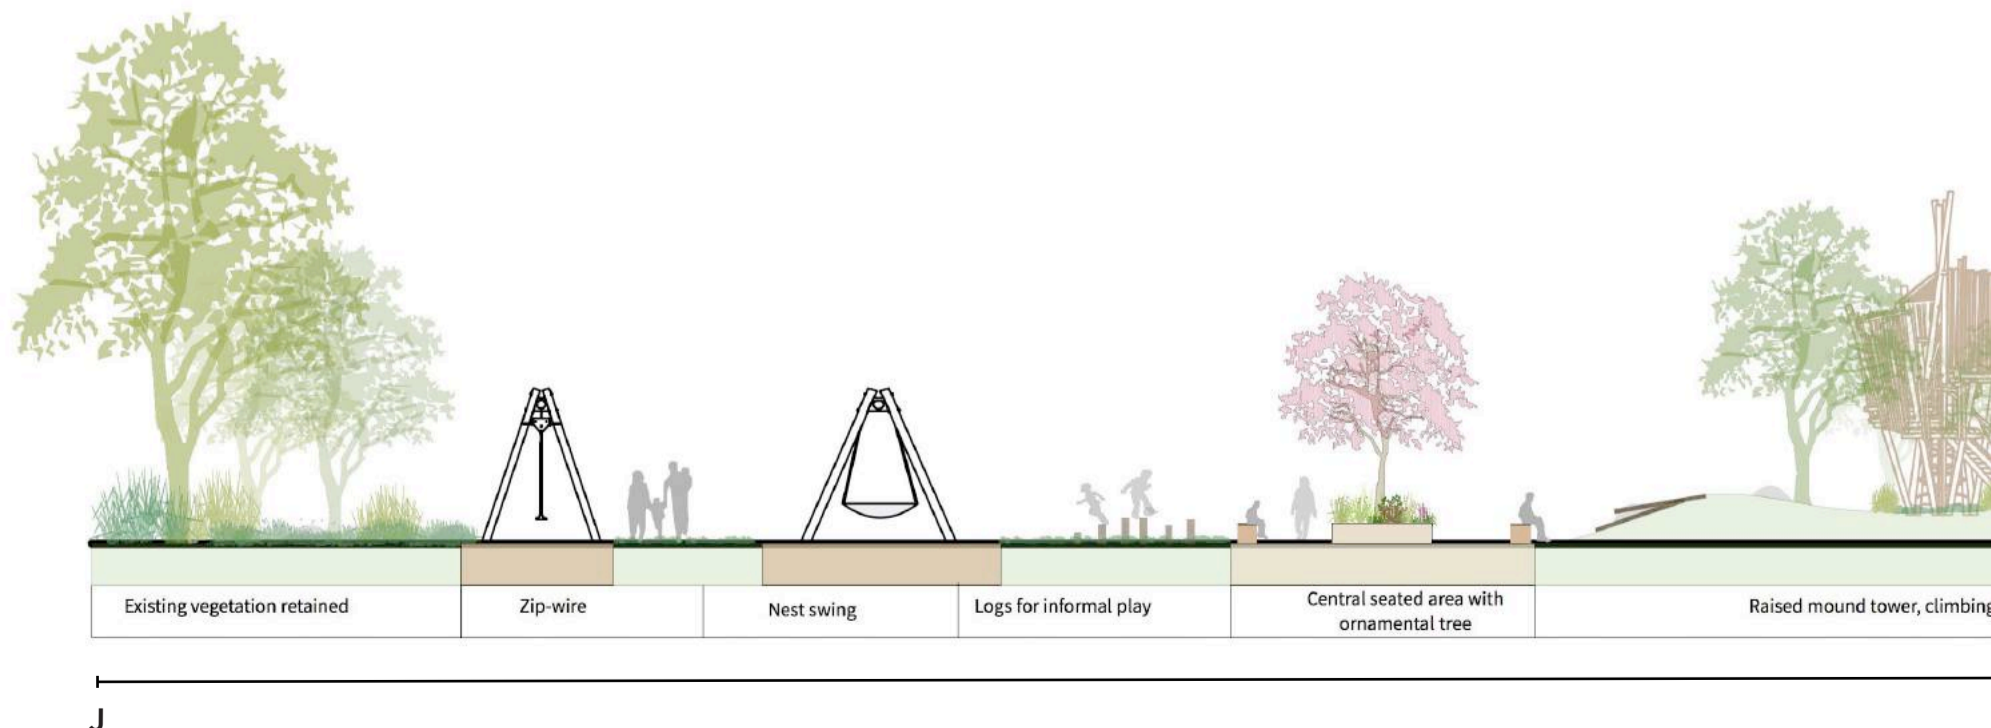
DETAILED LEAP/NEAP PLAYGROUND LAYOUT
